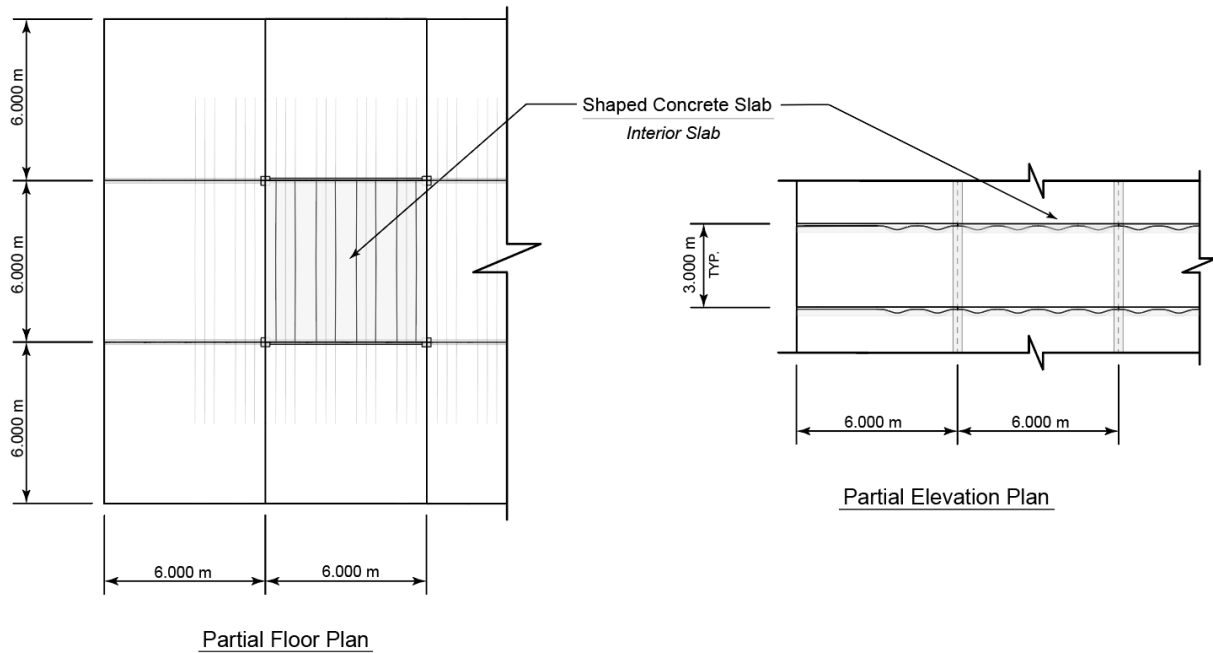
Partial floor and elevation plans incorporating a shaped concrete slab.
